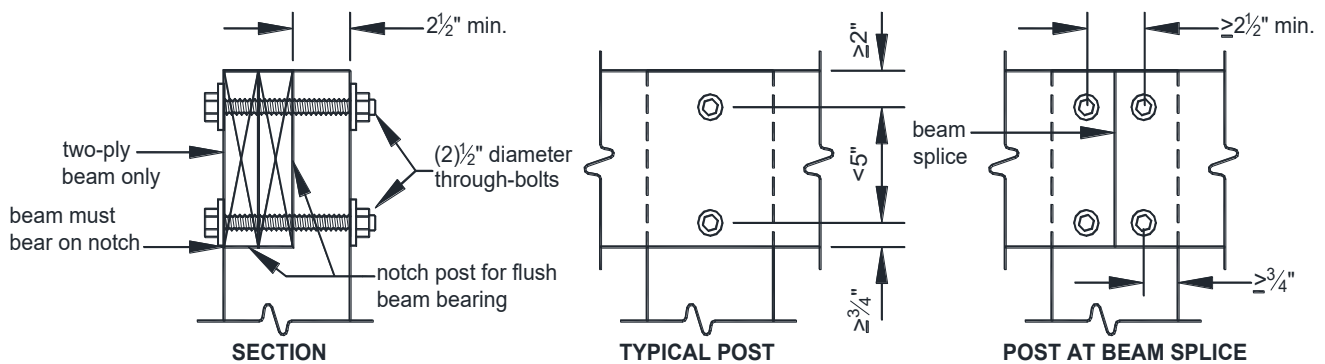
NOTCHED 6x6 POST-TO-BEAM CONNECTION
